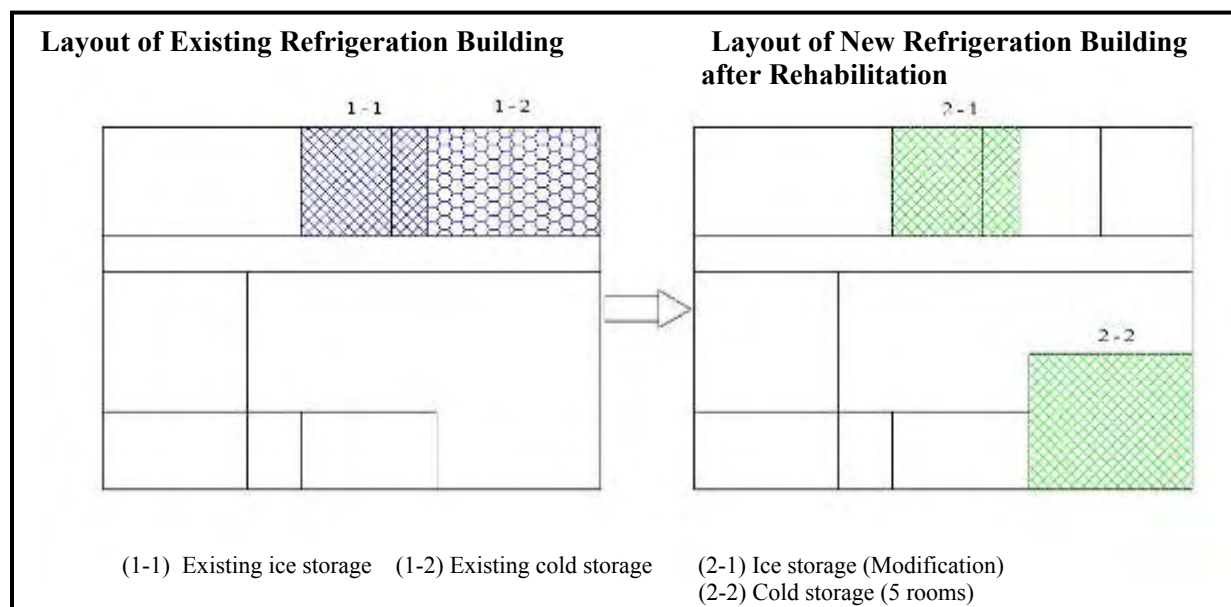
Existing Layout and Proposed Design of Refrigeration Facilities (Lucena)
